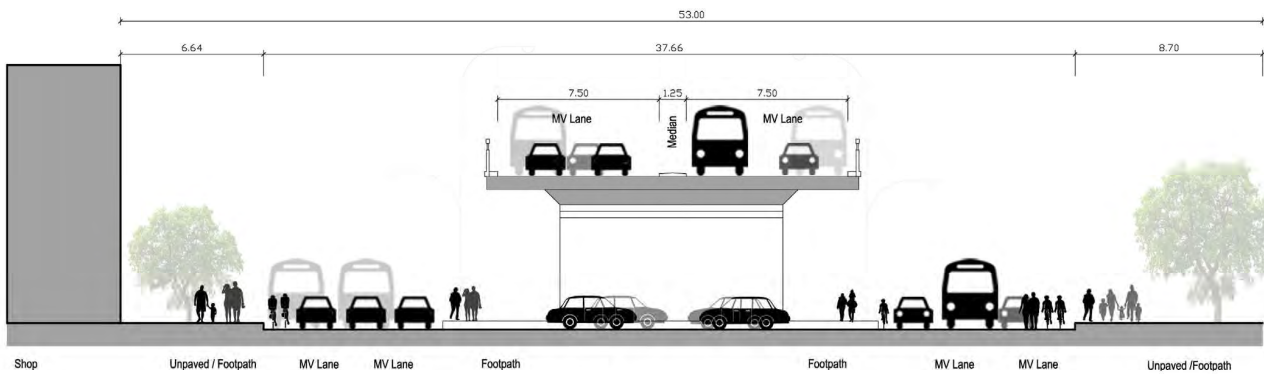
National Highway 2 - Existing Cross section BB (at foot of
